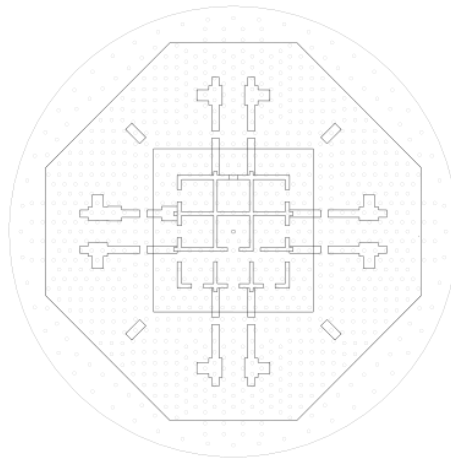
Layout of the core tube and pile foundation of Shanghai Tower
